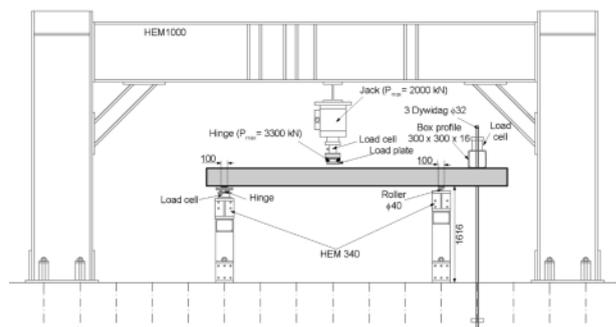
Test setup of reinforced concrete slab experiments in the Netherlands.
